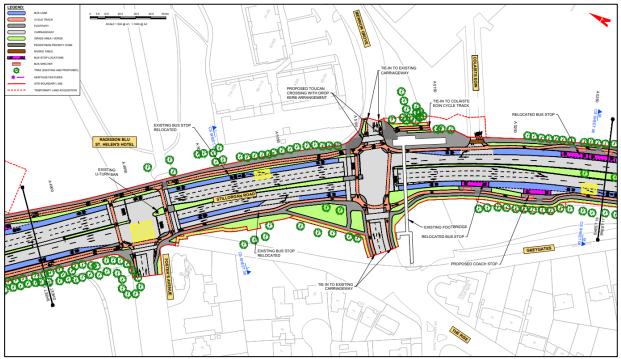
Extract from General Arrangement Drawings at Coláiste Eoin (Sheet 16)
